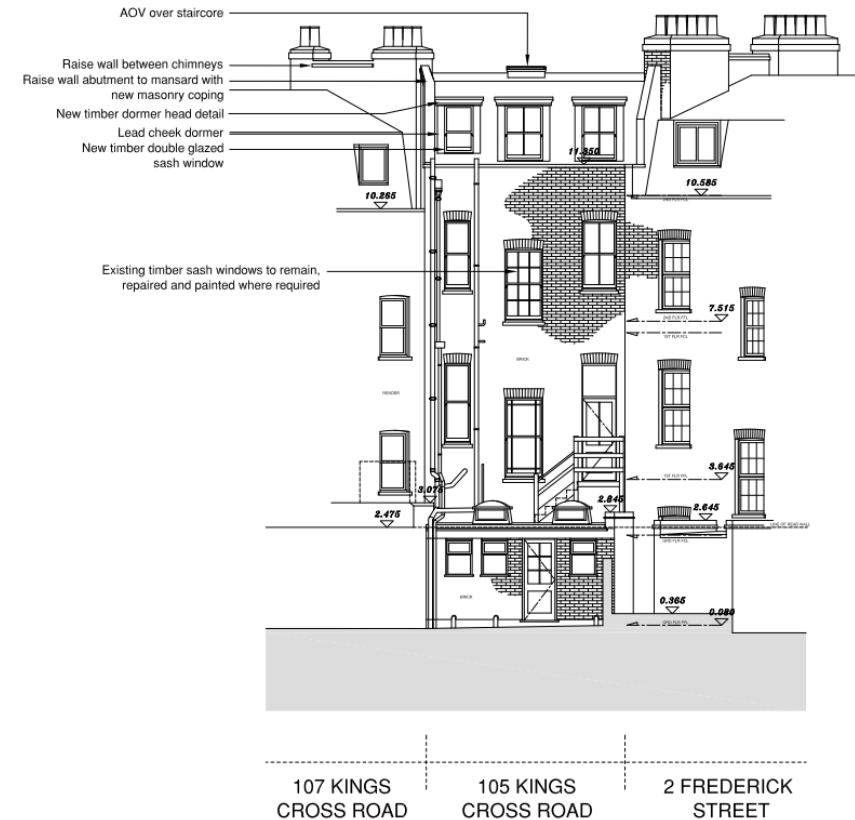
Proposed Rear Elevation showing the scheme as proposed.
